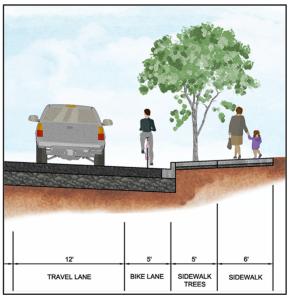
Bike Lane and Sidewalk Alternative (MM1).
